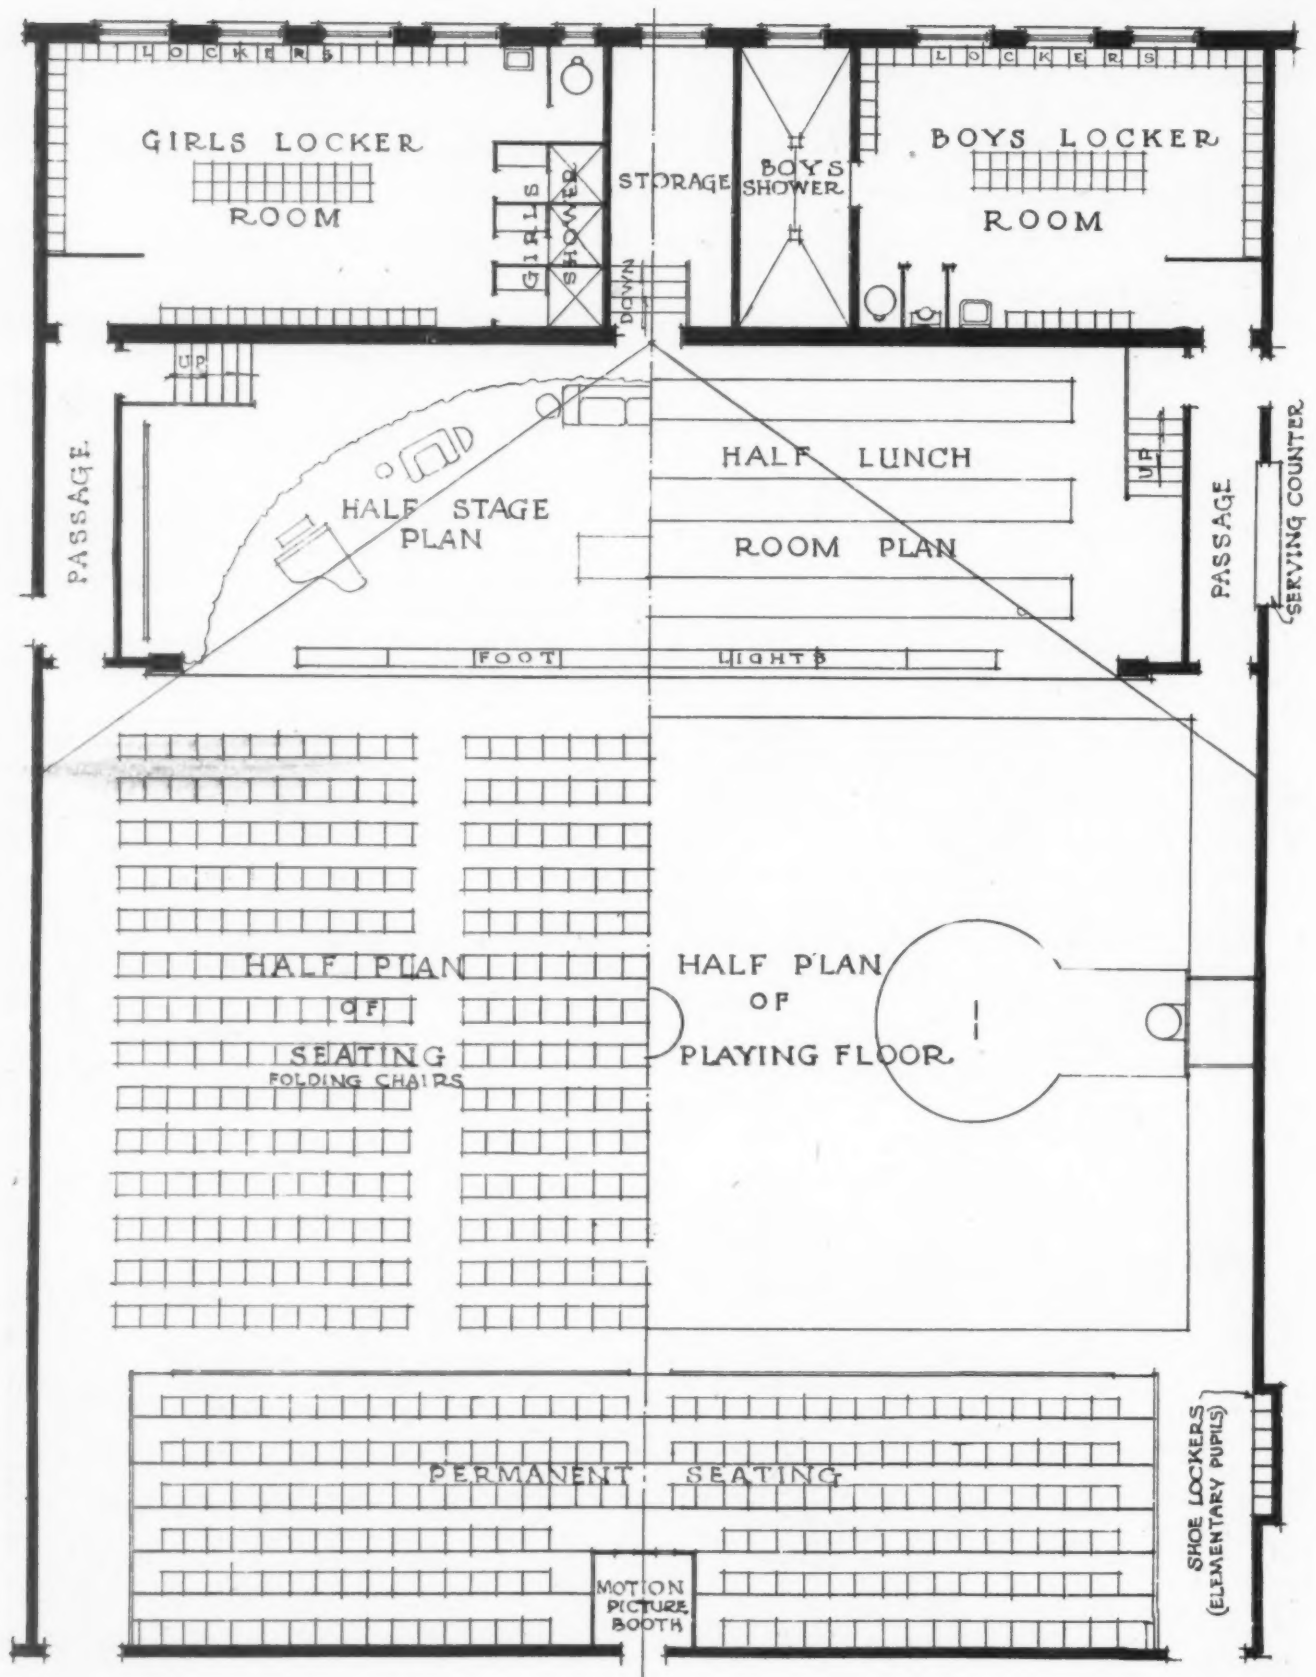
illustrates the floor plan of a combined auditorium-gymnasium. The plan is arranged in half sections to show the advantages of this arrangement. Comparison with Fig. 5 will show that this plan provides for a greater seating capacity, whether the room is used as an auditorium or a gymnasium. The lunch room and stage area are also much larger in this arrangement.
